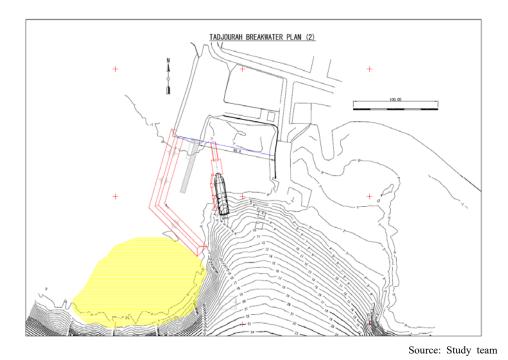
Breakwater construction design in the Tadjourah port (Alternative 1)
